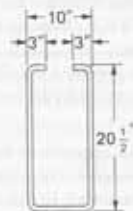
Stirrup details in beams 2B1 and 2B2.
